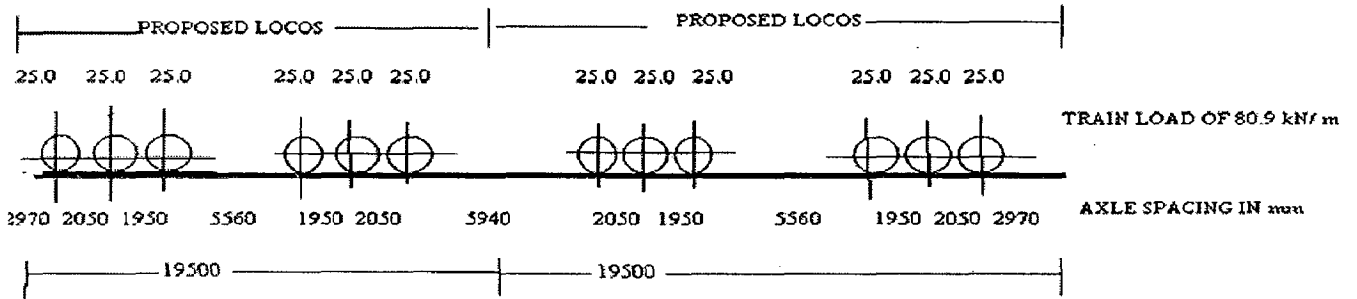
Modified Broad Gauge Loading (As per Bridge Rules 1964)
